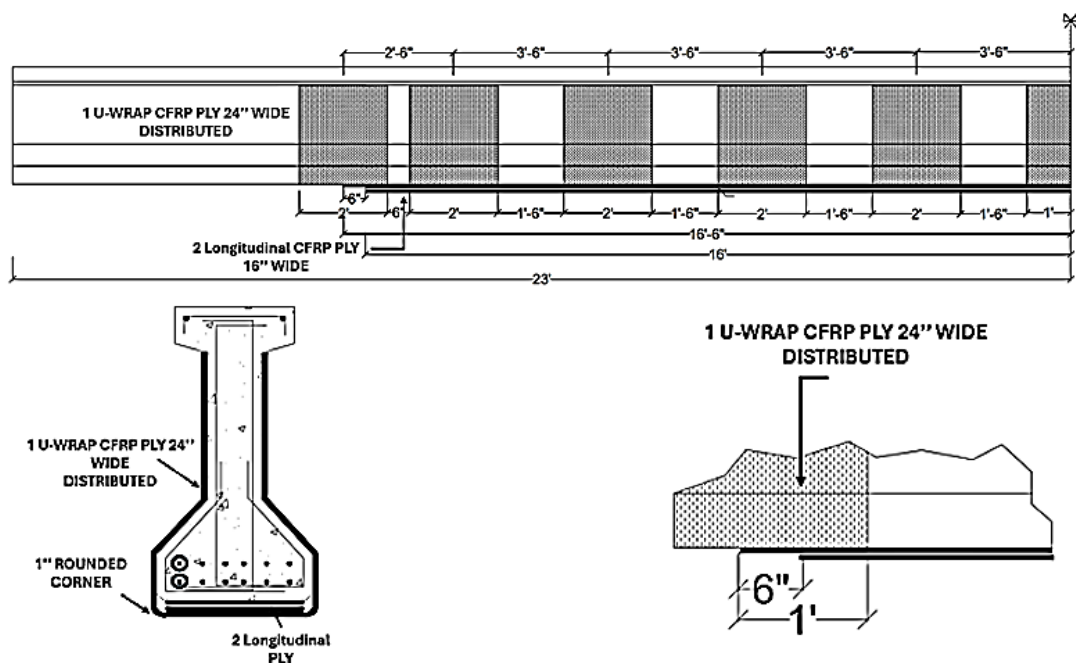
Elevation of repair of Girder G07, cross-section and CFRP U-wrap details, and termination details for longitudinal CFRP
